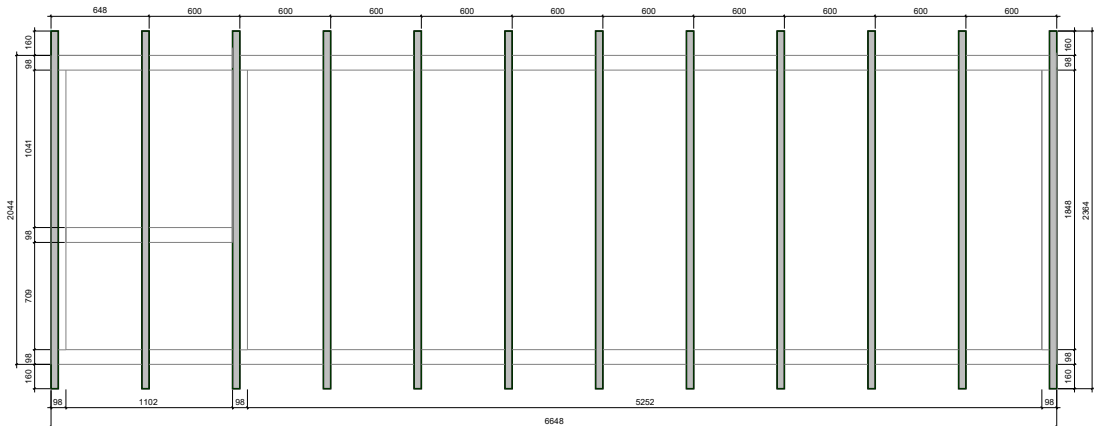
CONSTRUCTIONAL ROOF PLAN AFTER BUILD
